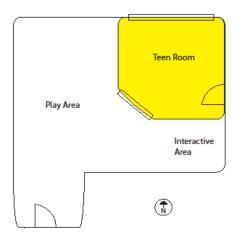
Presbyterian Hemby Teen Room Plan. Not to scale.
